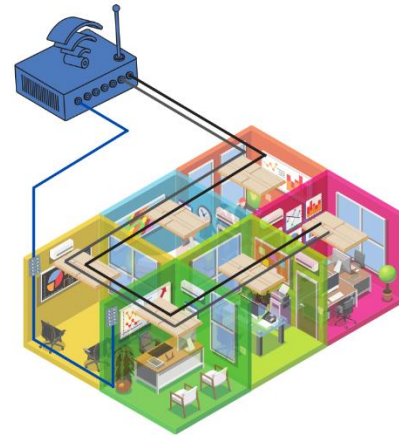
Traditional Applications: DALI-2 bus distributed to multiple luminaires throughout a building
